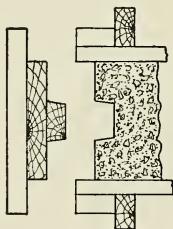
Method of joining foundation walls where it is necessary to leave an expansion joint or where concreting has been discontinued for any reason.
